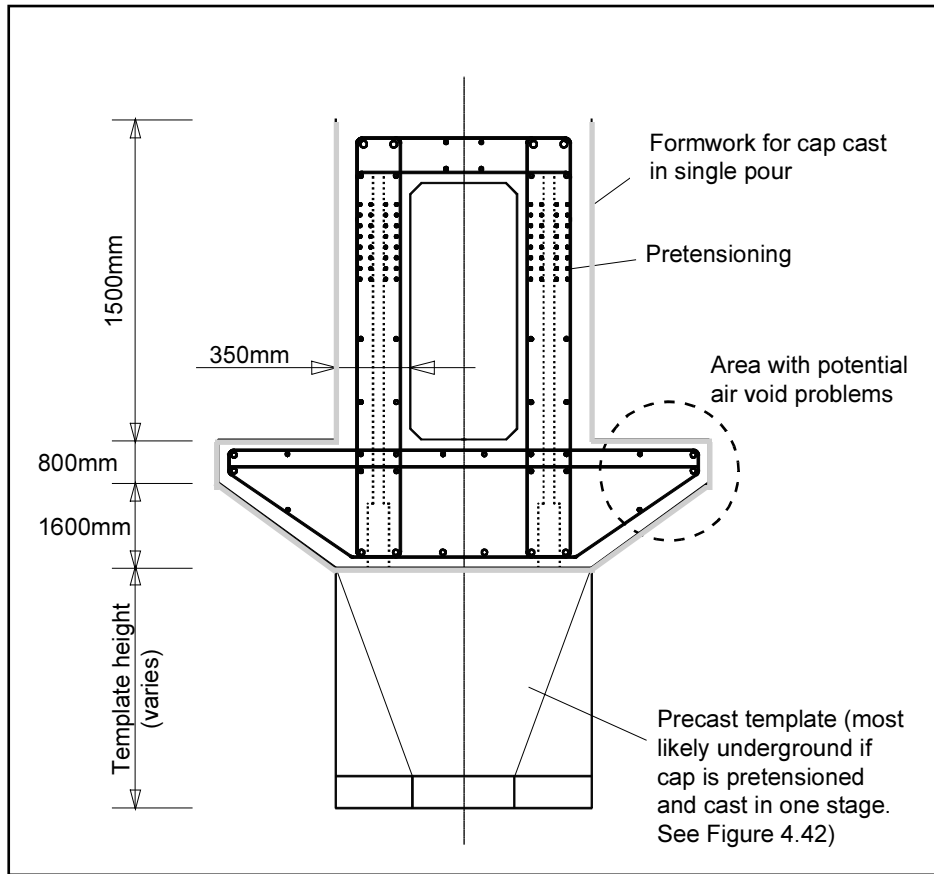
Cross-section through a cantilever of a pretensioned cap formed for a single-stage casting
